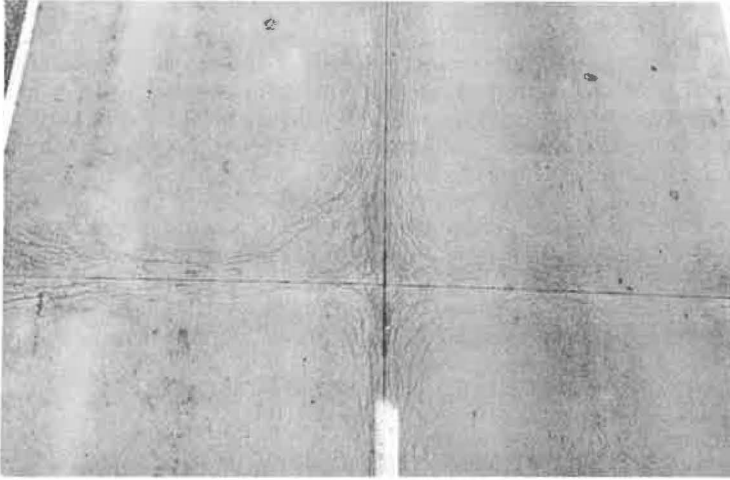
D-cracking along one side of transverse joint of 8-year old pavement.
